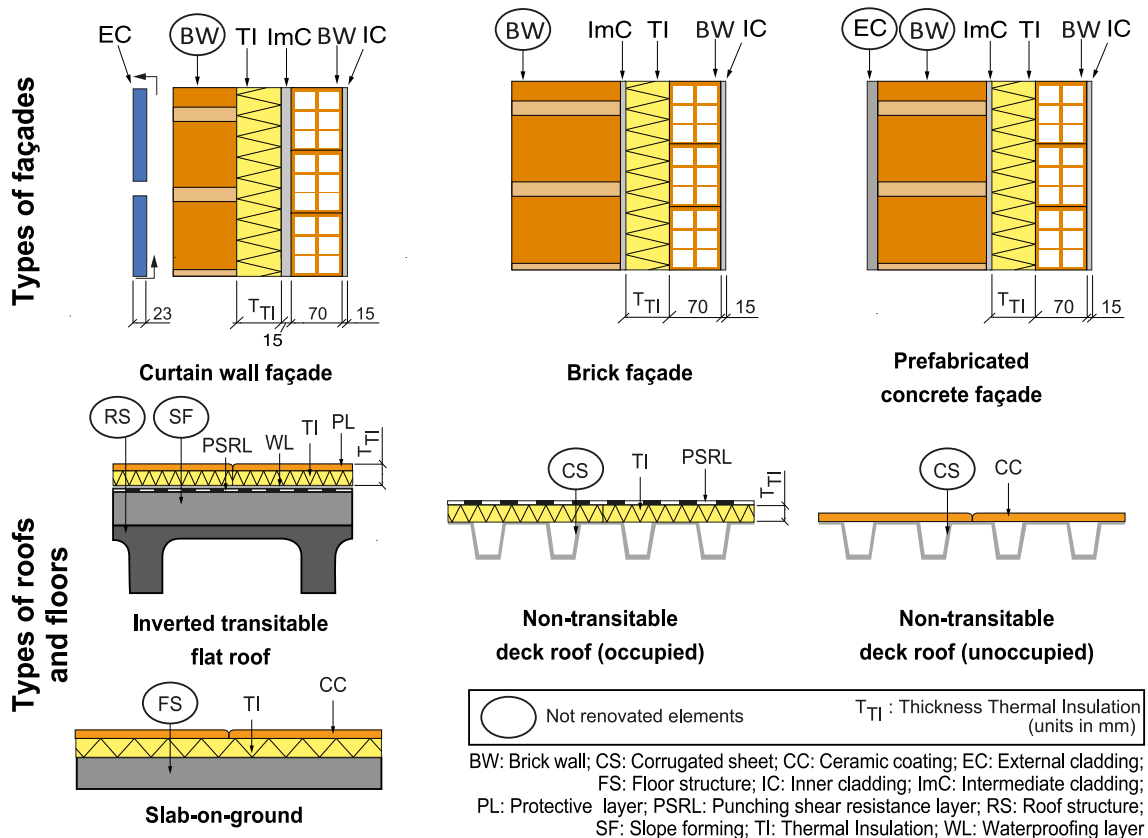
Constructive details of the types of façade, roofs and floors used in the renovation
